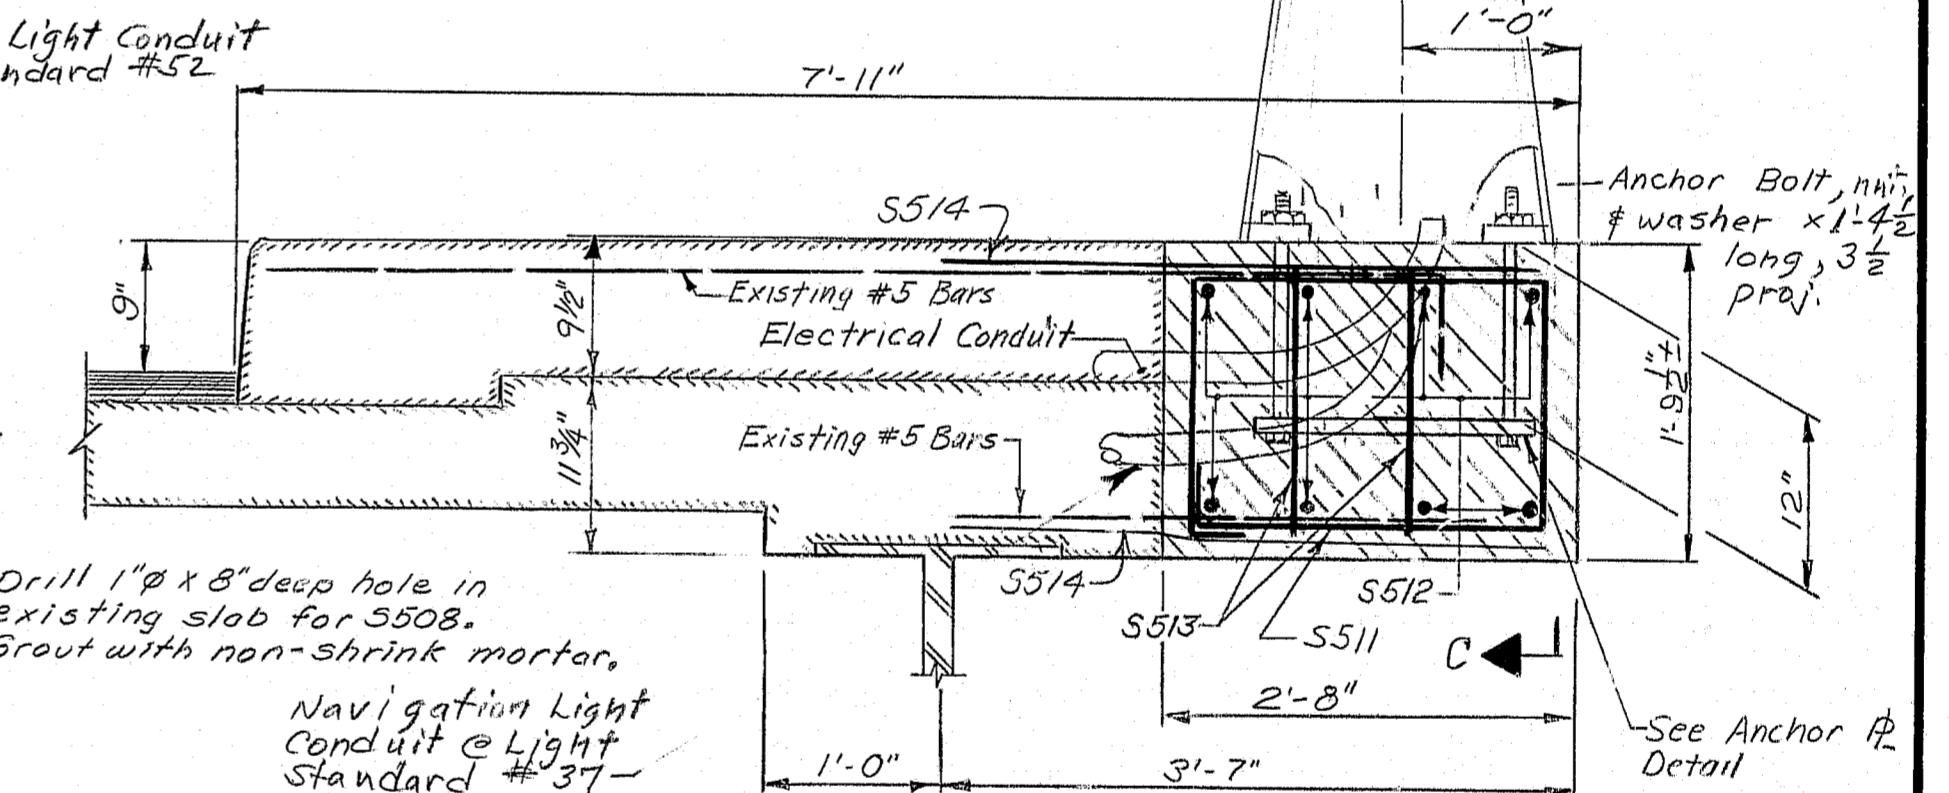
DETAIL AT LIGHT POSTS, CURB SECTION SECTION 9-9
